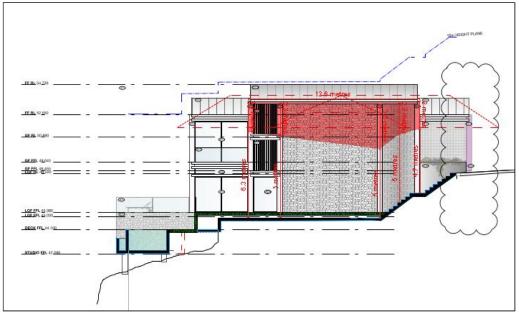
North Elevation (red highlighting numerical building envelope non-compliance)
